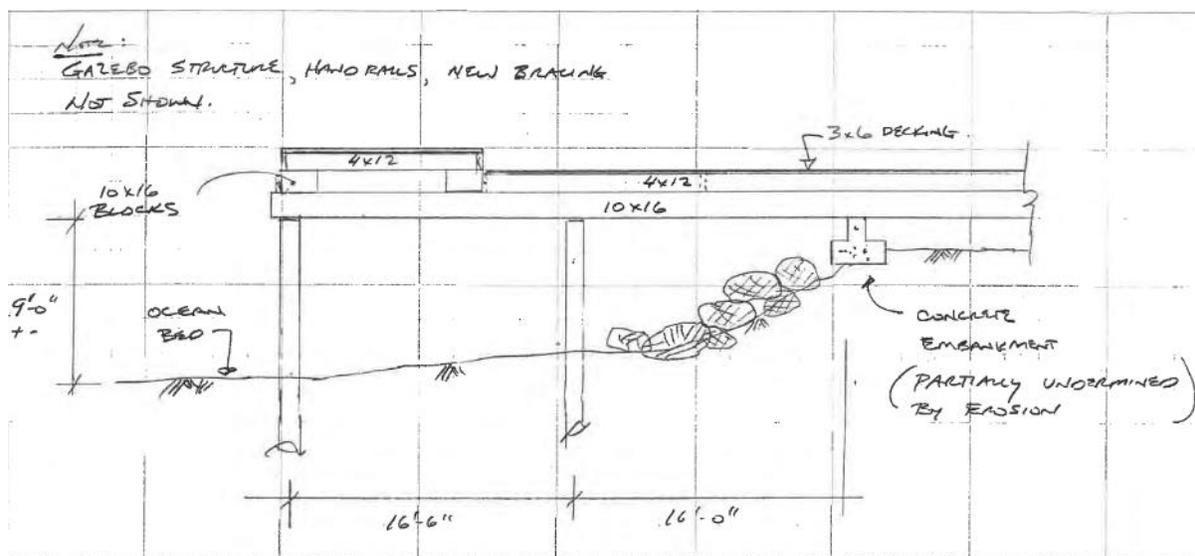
Section 1: General construction of boardwalk approach (2009 Ryzuk assessment)
